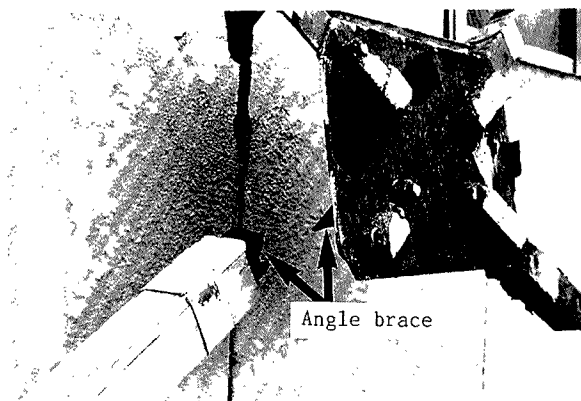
Failure of diagonal braces at their midheight connection: Kyuei Furniture Center.
